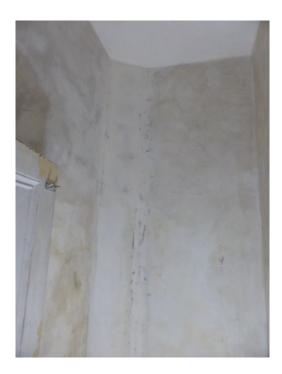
Boxed in waste pipe to cloakroom (plastered awaiting paint finish).
